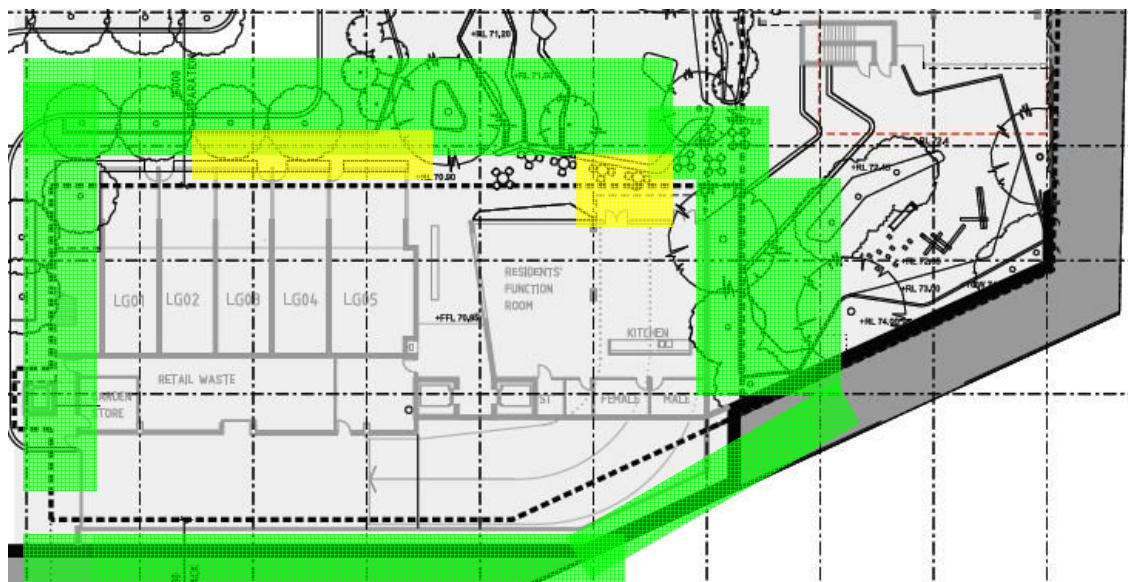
Schematic plan view of the proposed Building L with the recommended wind criteria overlaid on adjacent ground level areas.
